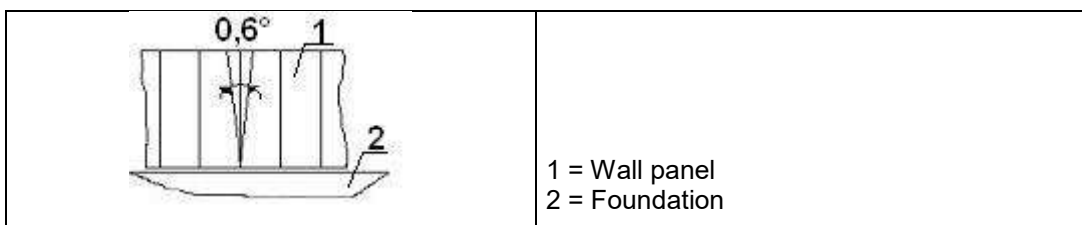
Wall panel (Permitted tolerances)
